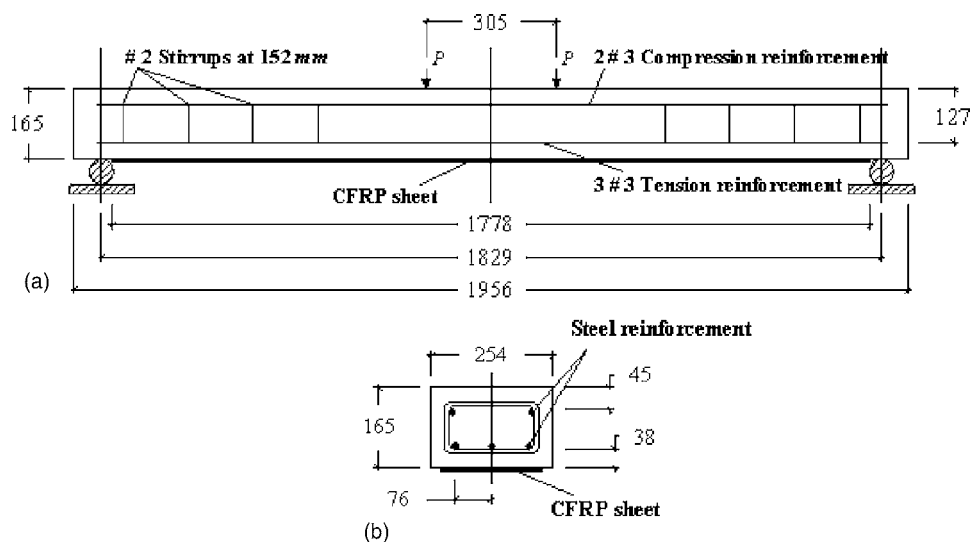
Geometry of the specimens: (a) Longitudinal section (mm); (b) cross section (mm)
